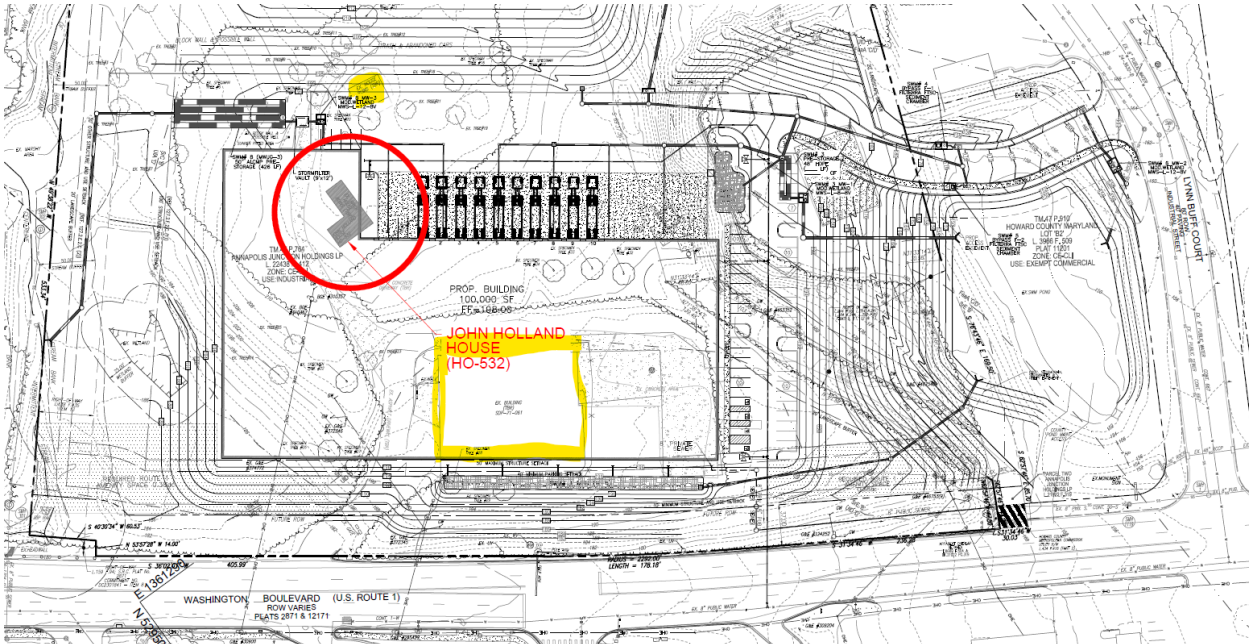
Image of site plan, with historic house circled in red, secondary house and warehouse highlighted in yellow.
